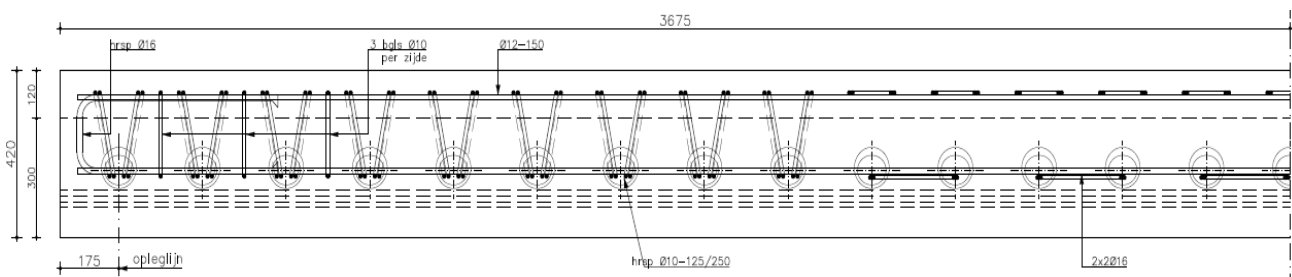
Schematic side view of the composite girder and the visible angled stirrups passing through the gaps in the precast girder
